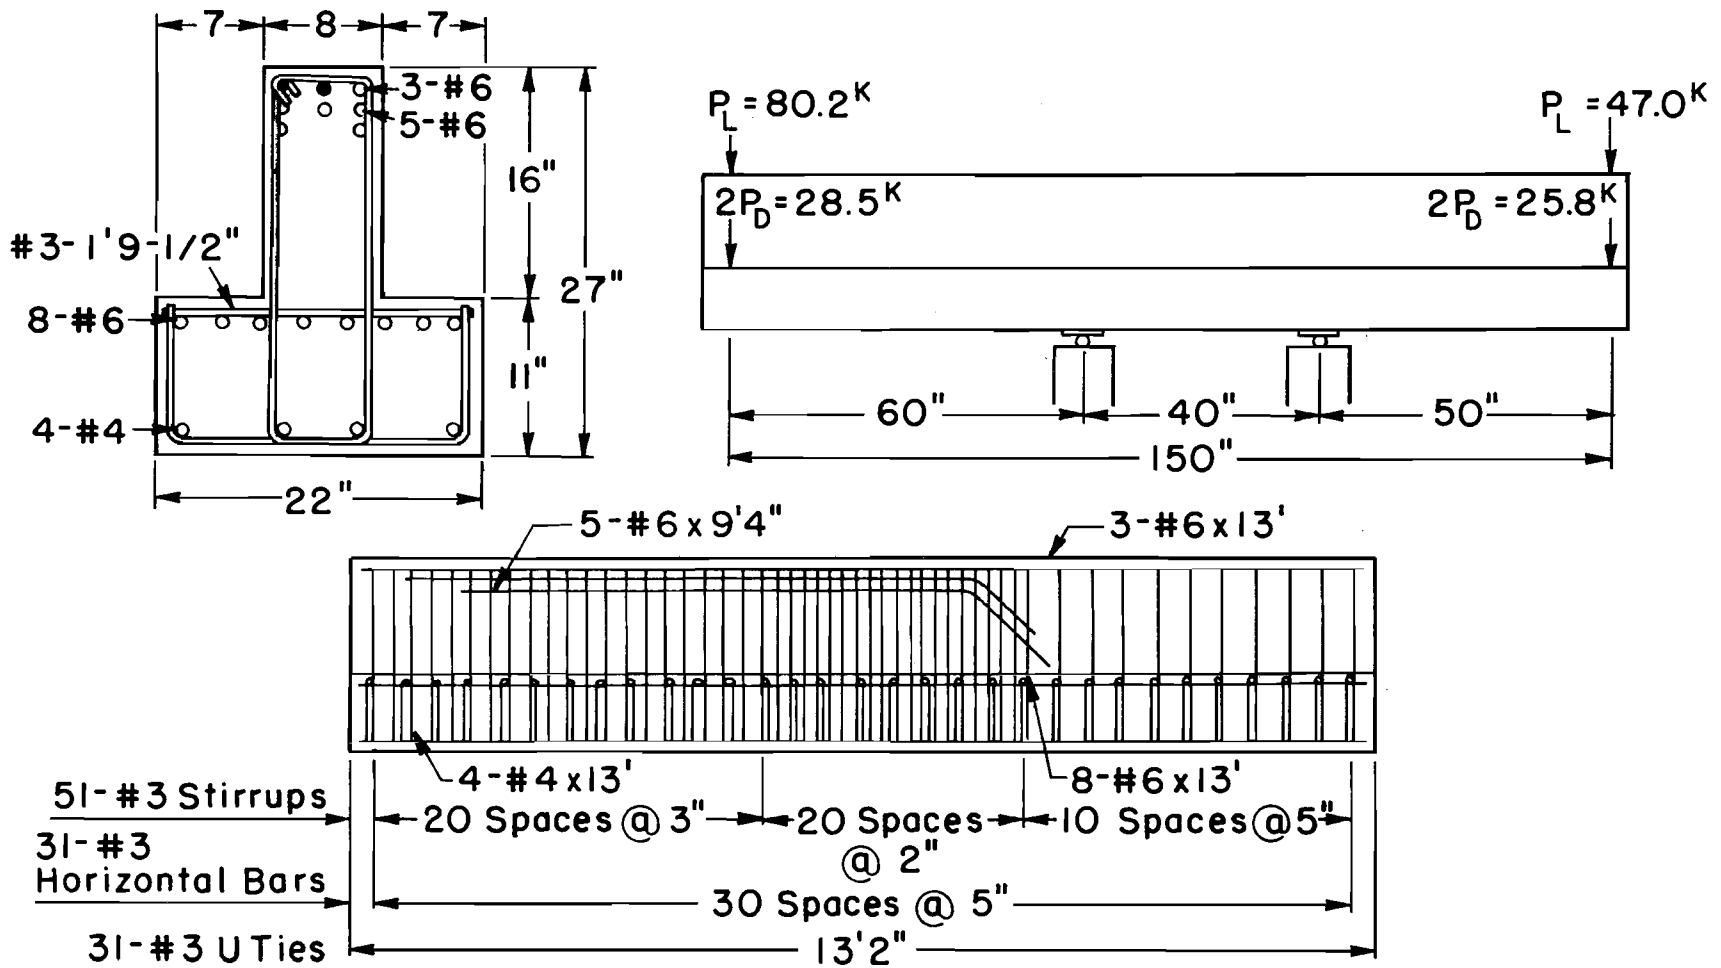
Dimensions, reinforcement, and predicted maximum loads for Beams BMC2 and BMCP2
